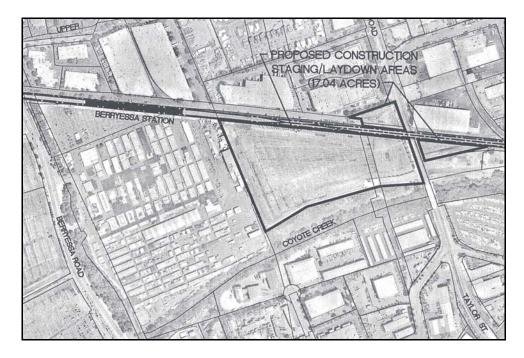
Construction Staging Site on Either Side of Rail Corridor North of Mabury Road
